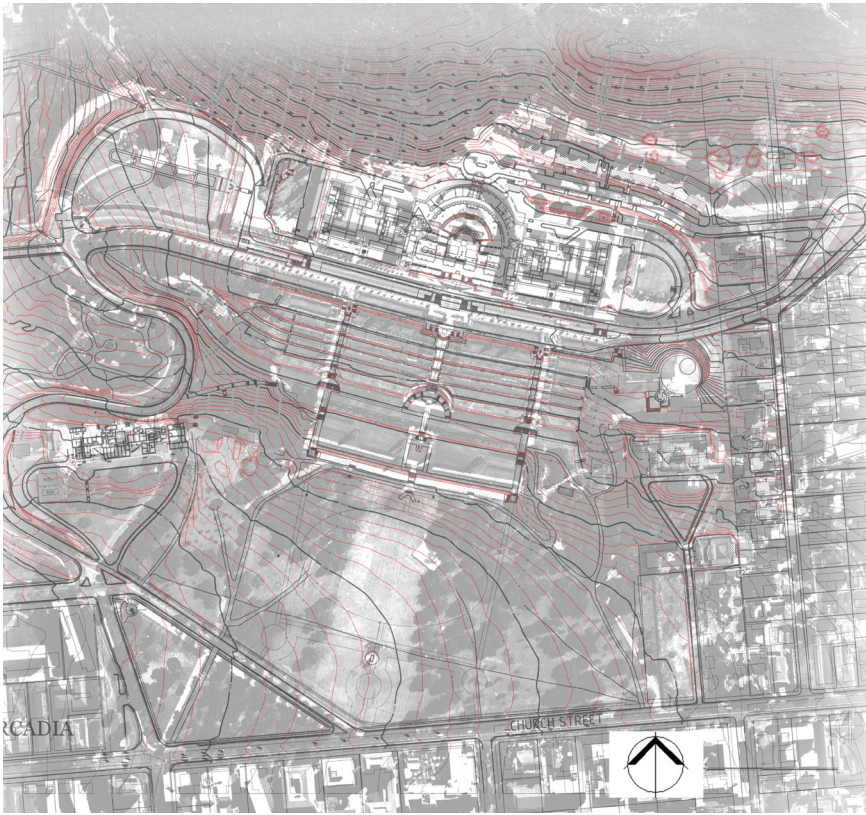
Site plan of the Union Buildings (Author, 2015)
